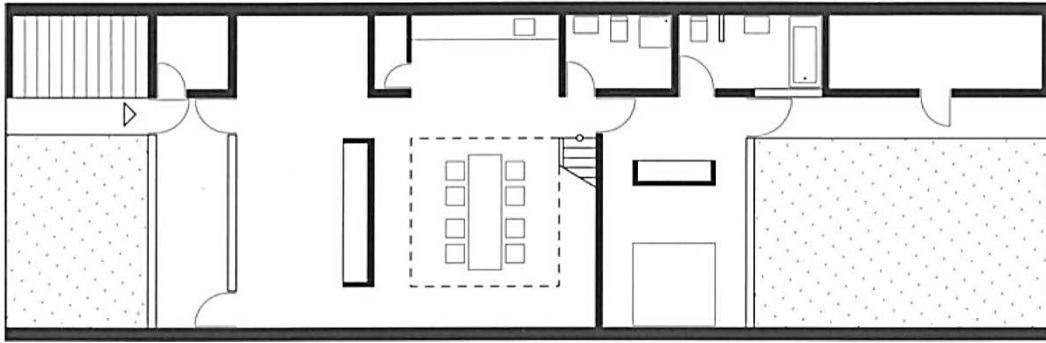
Housing group Kranichstein, Ground floor plan, East-west orientation
